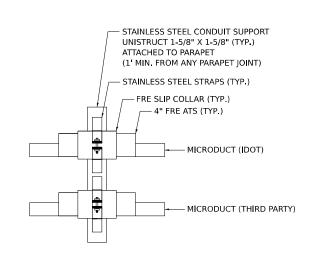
WB OVER HOUBOLT ROAD TYPICAL CONDUIT SUPPORT DETAIL
